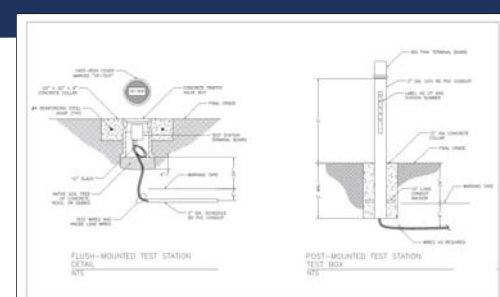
Flush Mounted and Post Mounted Test Station Standard Details.
